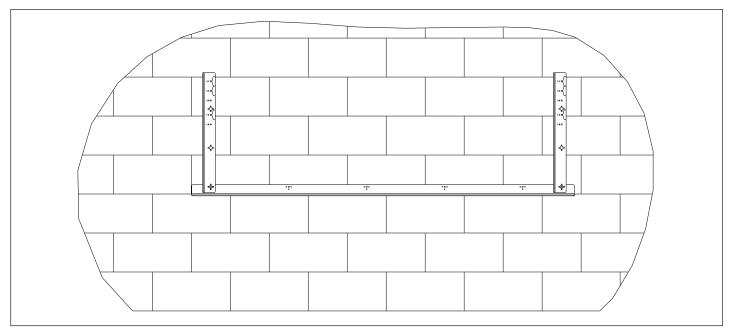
Install Second Row Horizontal Wall Angles Vertically
